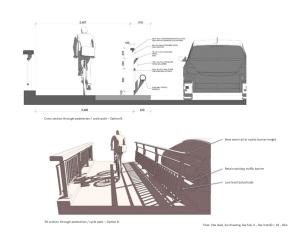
Balustrade Option B - New designed handrail with existing barrier.
